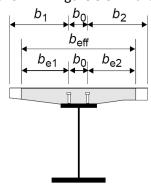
Effective width of a concrete flange. Adapted from [85]
